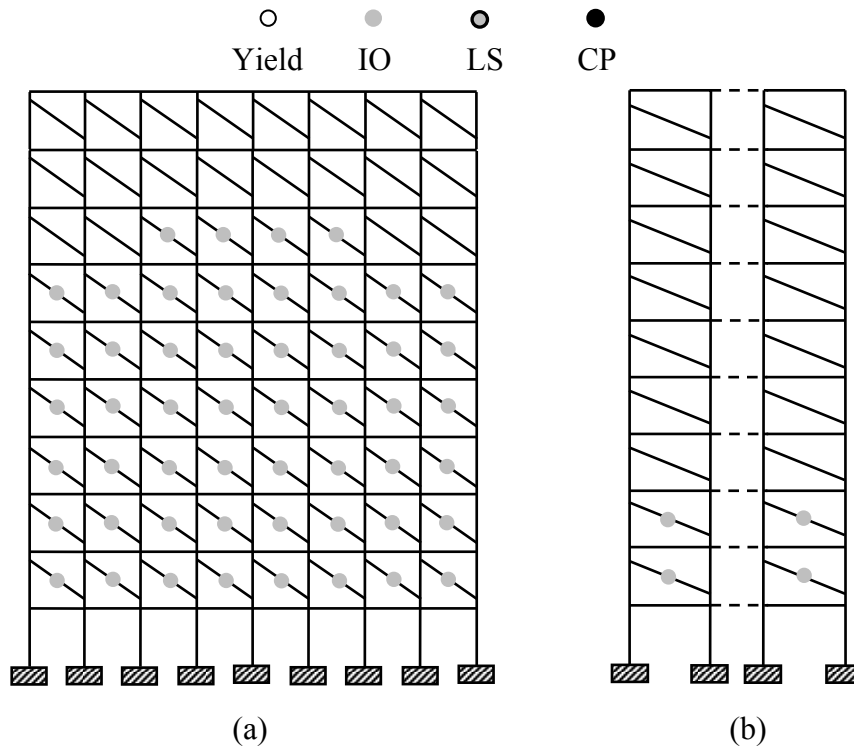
Hinge pattern at performance point under DBE of ten storey RC infilled frame buildings with open ground storey, designed as SMRF without considering provisions of BIS (2002) for open ground storey: (a) typical longitudinal frame; (b) typical transverse frame.
